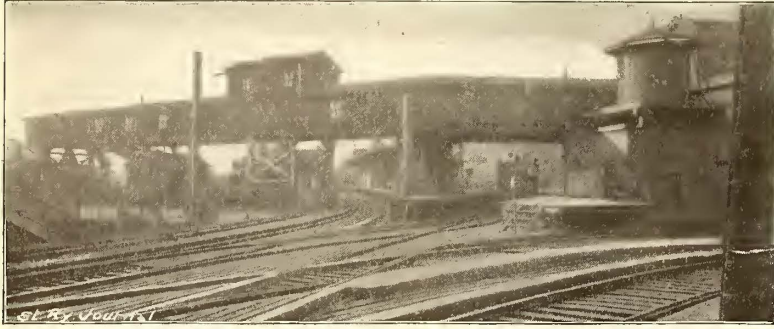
COALING STATION FOR SECOND AVENUE LOCOMOTIVES—NEW YORK ELEVATED RAILWAYS.
